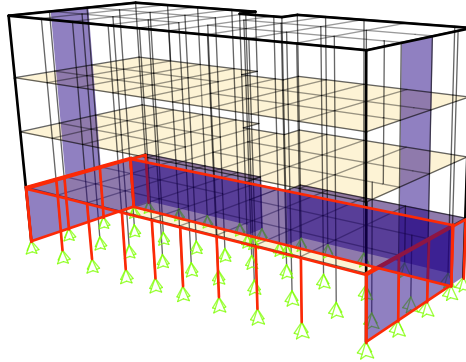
Retrofit 11: Addition of Moment Frame at Entirety of Soft-Story and Oriented Strand Board on Lateral Walls and Veranda.
